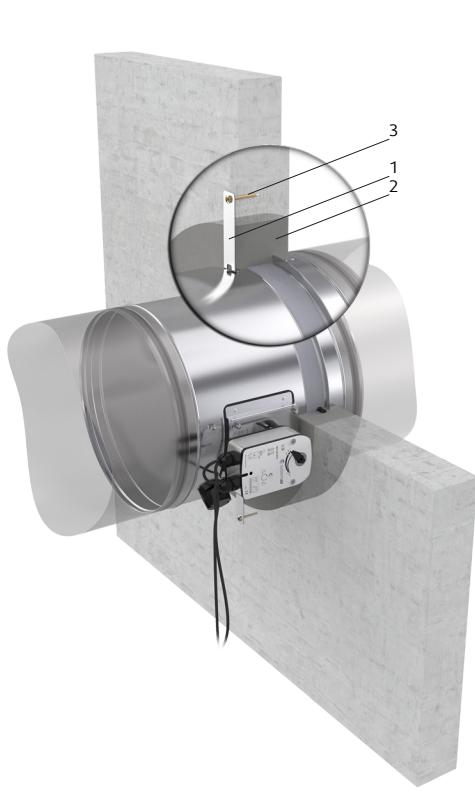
Wet installation of a round fire damper PKIR using a mixture of plaster with mortar or concrete
